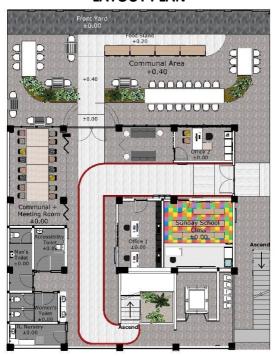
Layout Plan of First Floor (Source: Writer, 2023)
